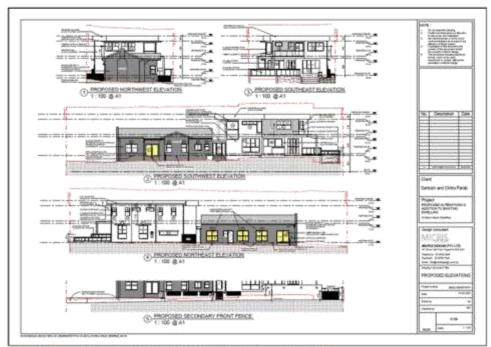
Proposed elevations (received by Heritage 21 on 11 September 2020).
